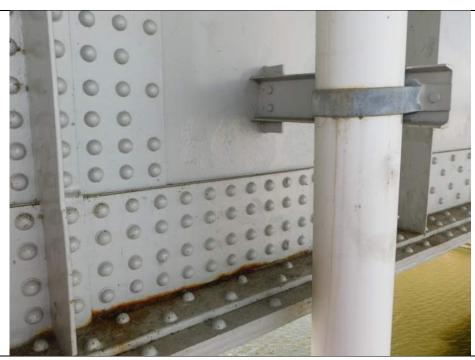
[Span 4] -Girder 4W East lower web between FB29S-30S exhibits minor localized corrosion along edge of thickener plate and localized section loss to web at drainage location, Looking Northwest
